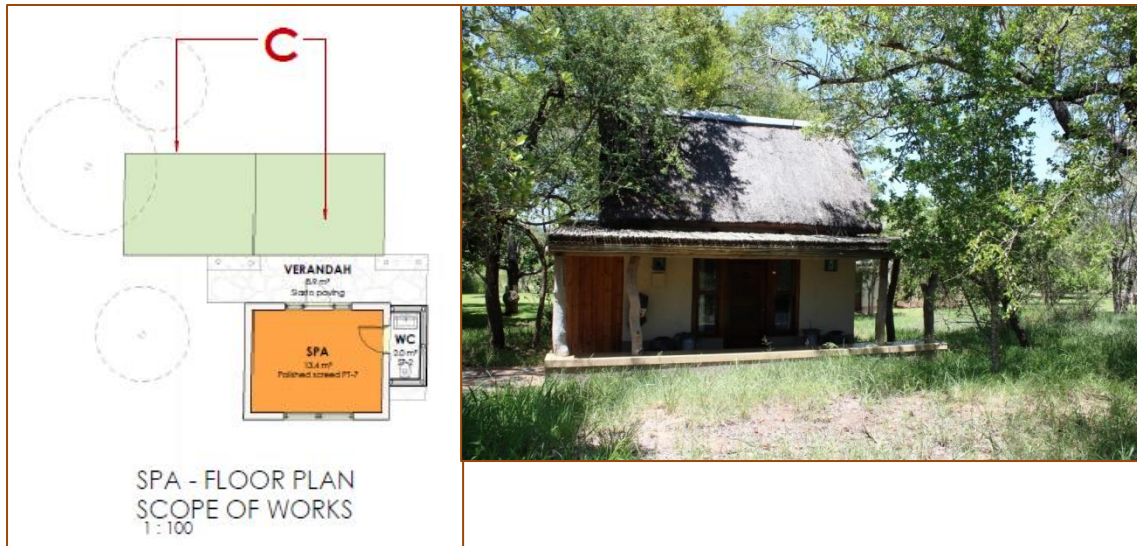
The floor plan showing the proposed two new treatment rooms in front of the existing spa and a front view of the spa (© K. Zunckel).
